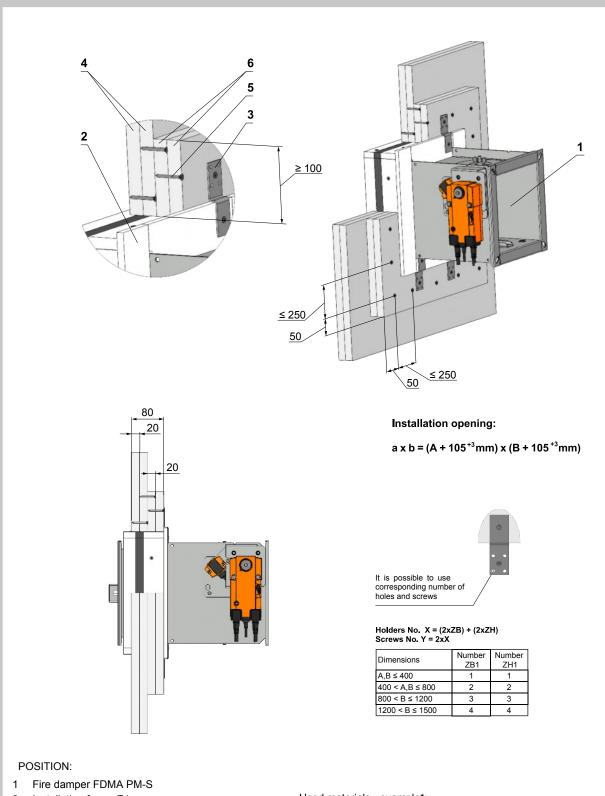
Thin shaft wall - Installation frame E1 - RECTANGULAR DAMPER
